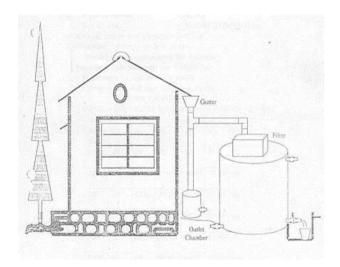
Components of Roof Catchment, and a roof water harvesting structure whereby rain is collected from two sides of the roof and directed through gutters to the plastic raised tank
